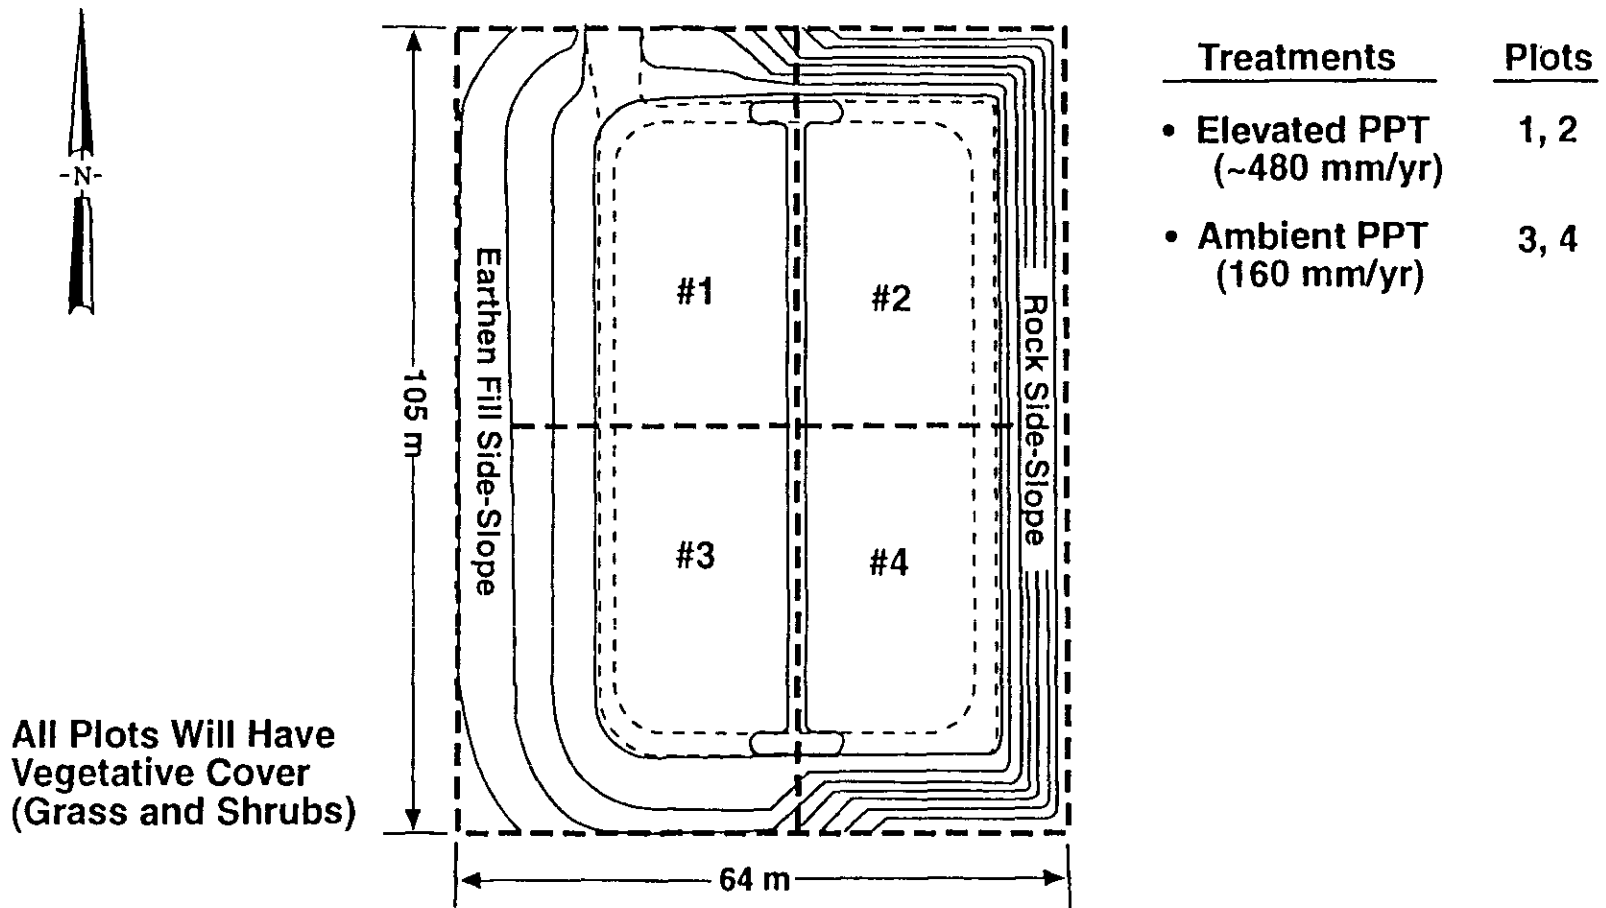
Plan View 200-BP-1 B-57 Cover System
